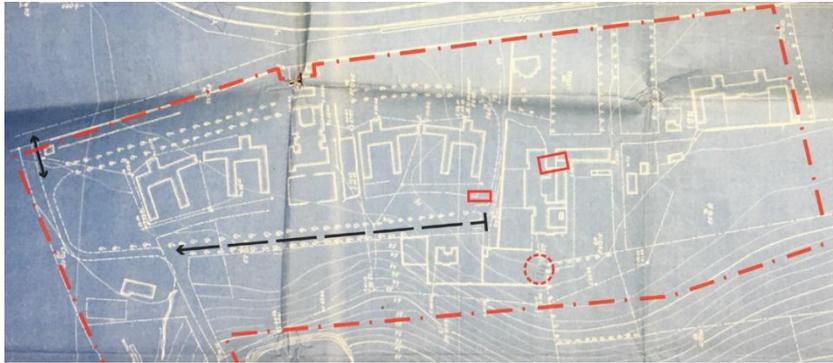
1920: Site plan with contours and planting identified. The axial avenue is shown as tree lined. The ring road is re-routed to accommodate Nurses' House(Source: KAB 3/CT 4/1/4/187) (Winter, Baumann & Wilson)
